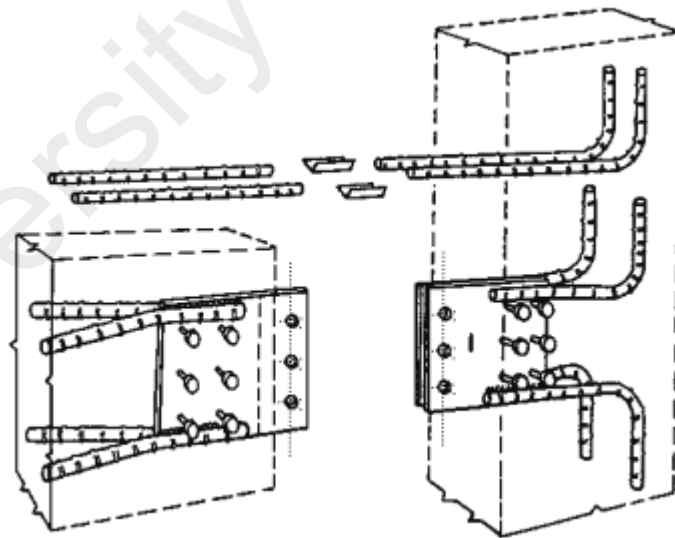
Unsuccessful type of precast beam to column connection (Elliott,1996)
